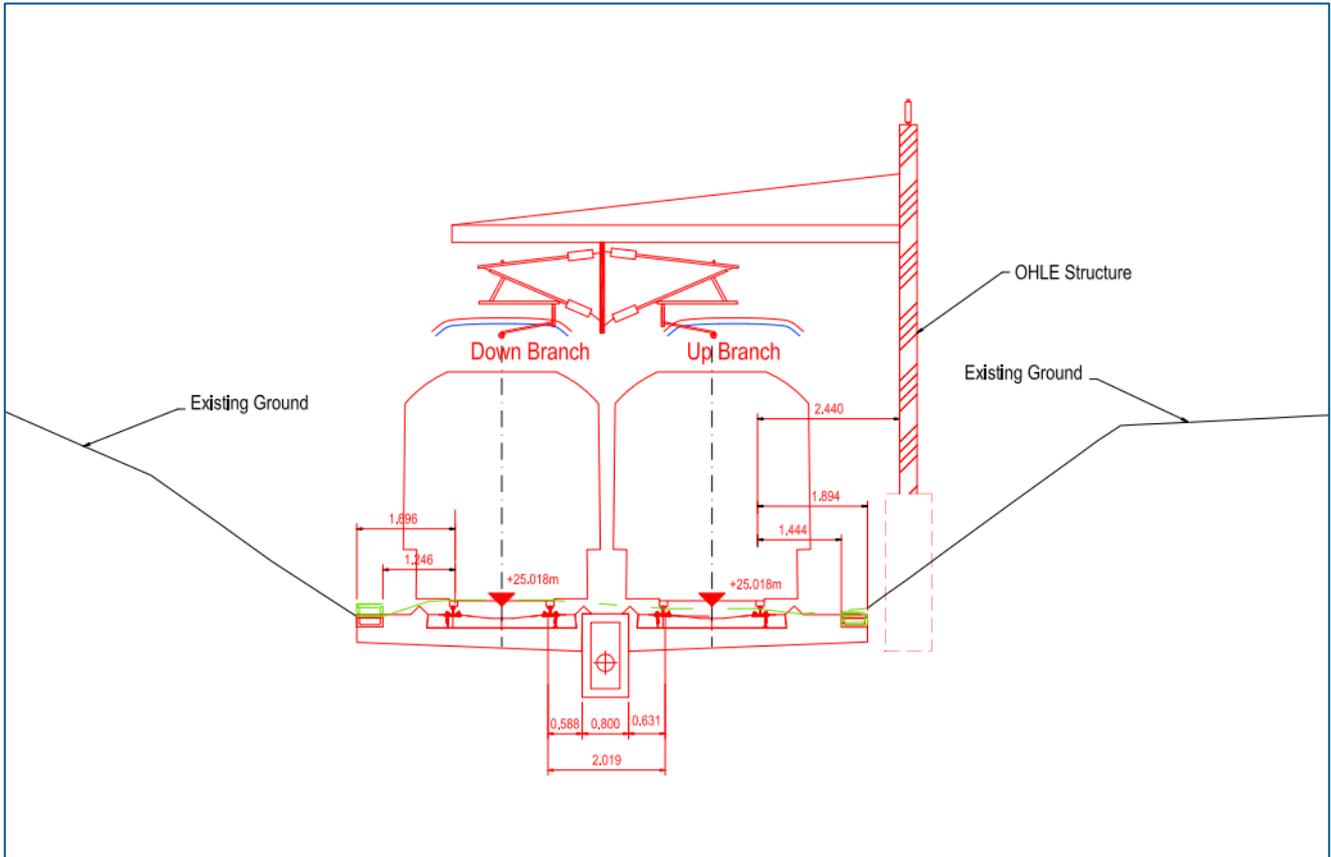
Typical Cross section west of Glasnevin Cemetery Bridge (OBO10), view from Glasnevin Junction
